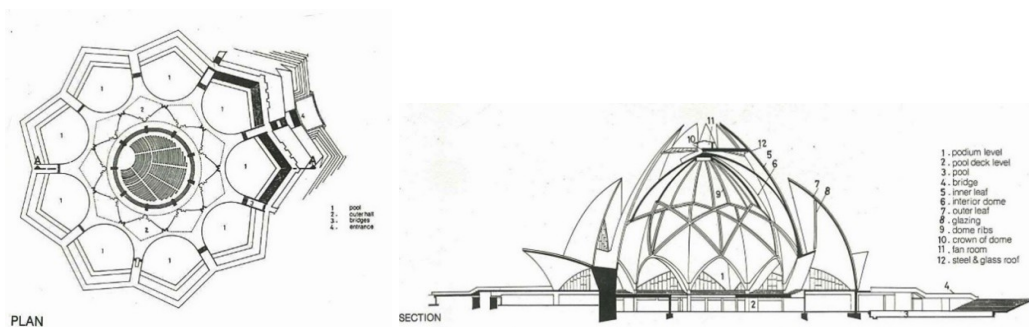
Plan and Section of Lotus Temple, New Delhi (Source: World Architecture)
